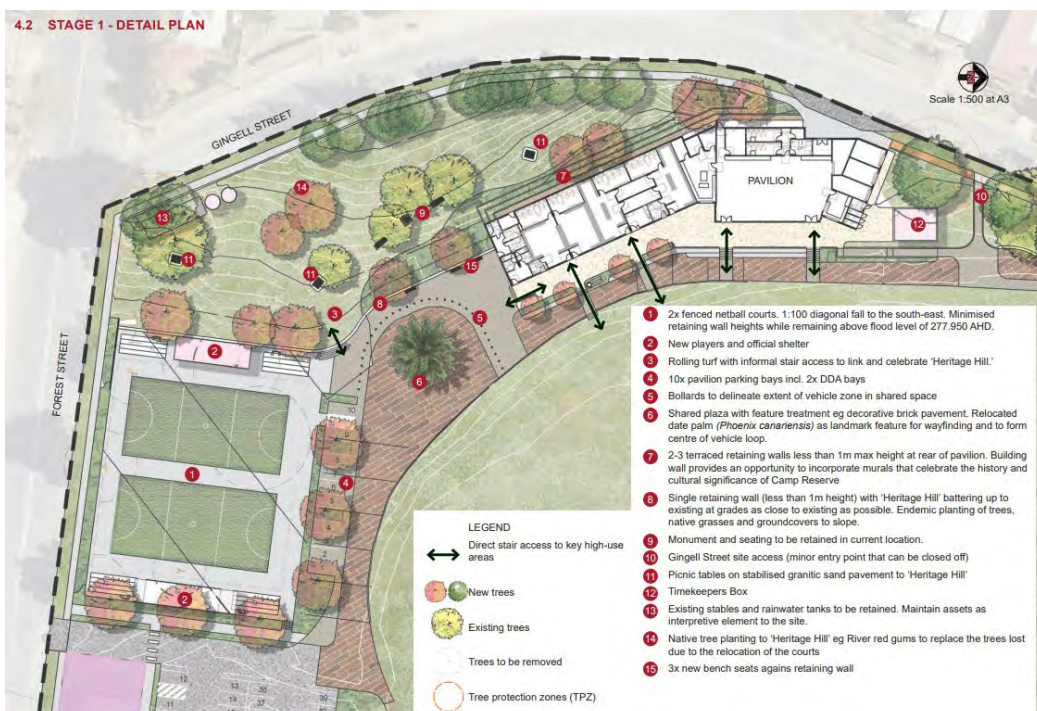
Stage 1—Detail Plan. (Source: Taylors, December 2024).
